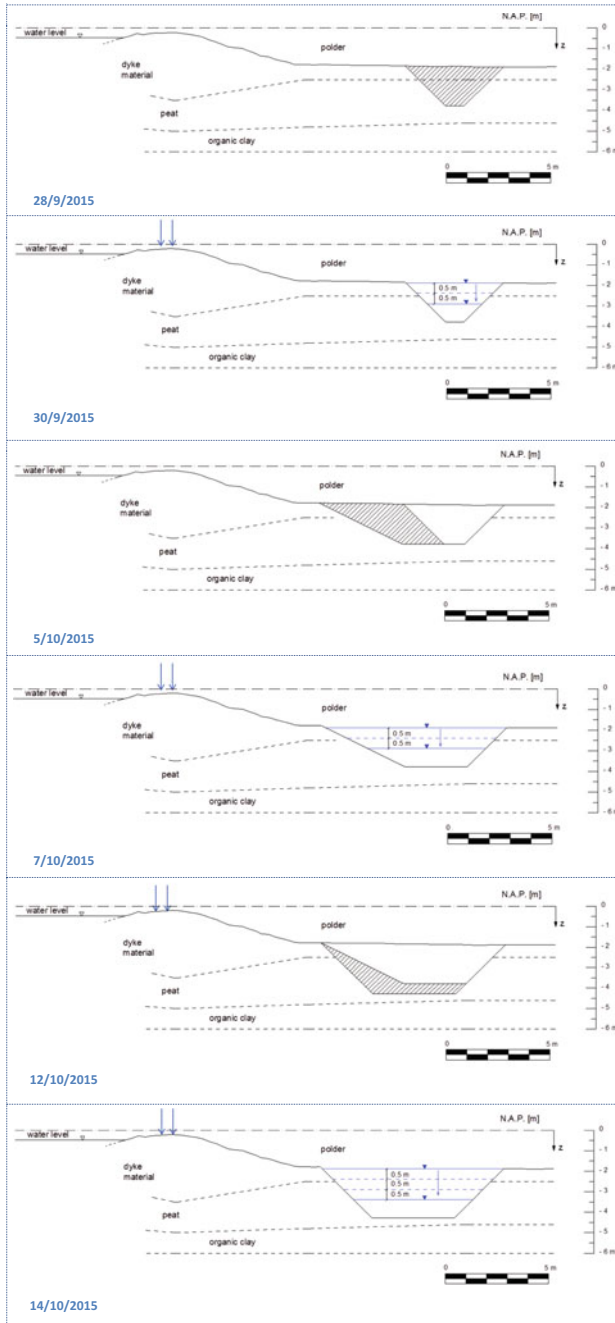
Schematic drawing of the stress test stages, first excavation, first dewatering, second excavation, second dewatering, third excavation and final dewatering. The excavation is scaled with the geometry of the dyke
